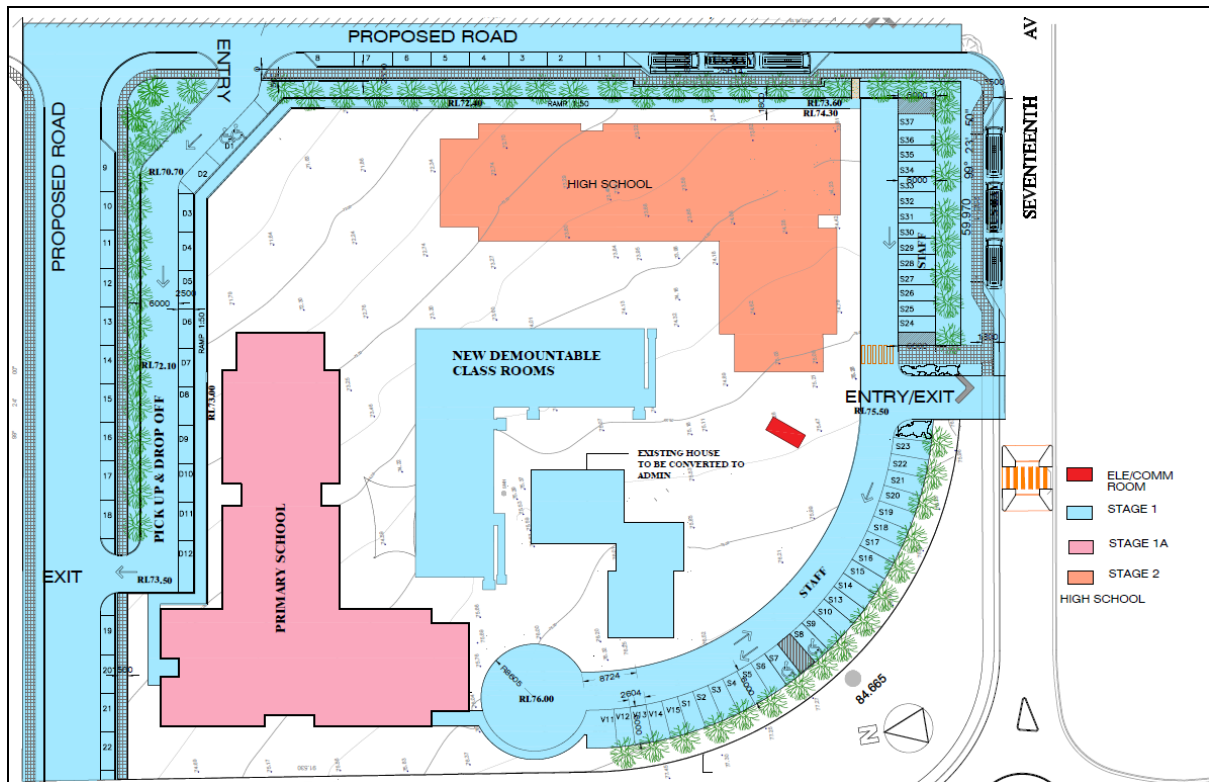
Extract of modified Stage 2 Site Plan (North to left)
